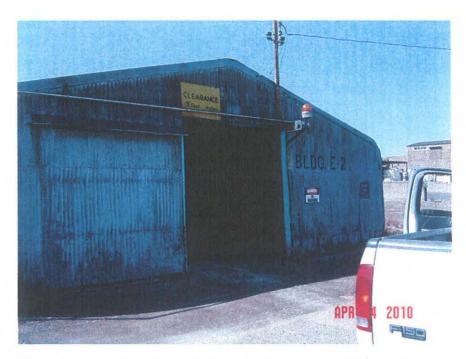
Example of metal building with loose and flaking paint on the interior beams. Four Buildings such as this one are located on the north side of the facility.
